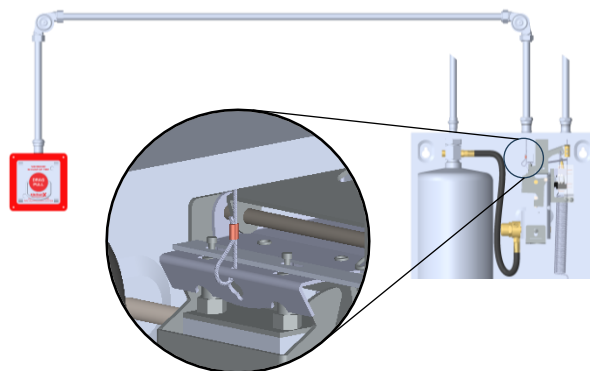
Crimp the wire rope with an oval sleeve with 50 to 75 mm excess wire. After crimping, use a wire cutter and shorten the wire rope down to maximum 10 mm.
